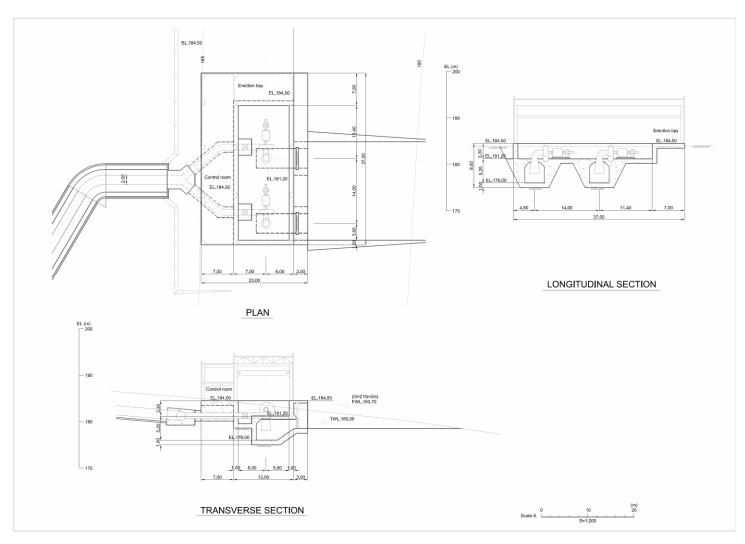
Plan and Sections of No.35-2 Power House
